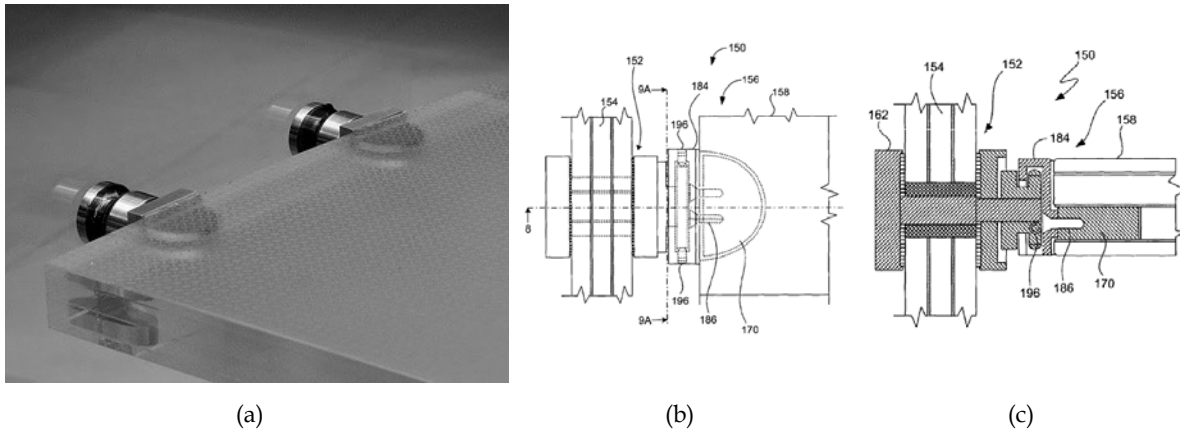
General view (a), detailed upper view (b) and detailed cross-section (c) of the Apple store glass staircase embedded connection developed by O'Callaghan.
